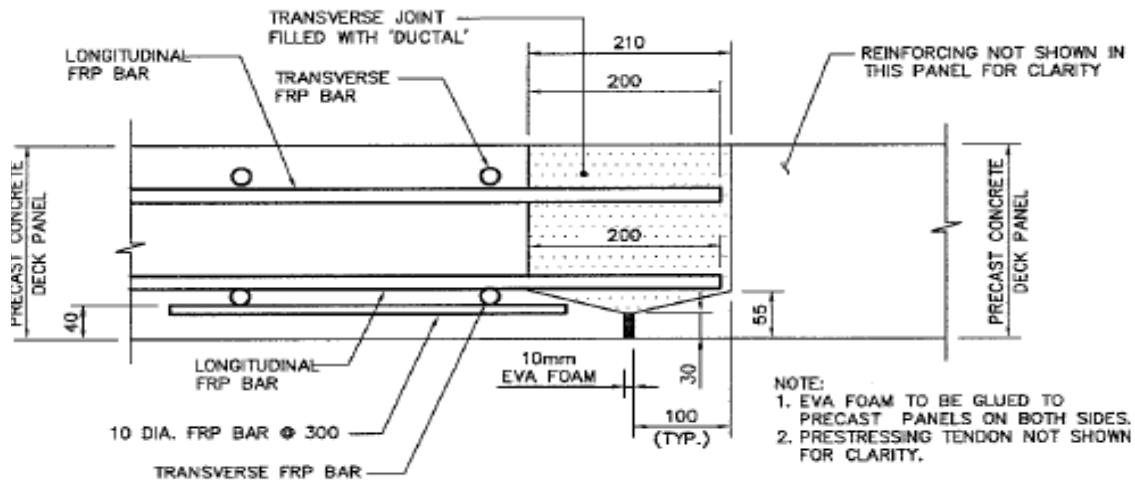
Typical Section through a Transverse Full Depth Precast Panel Joint
